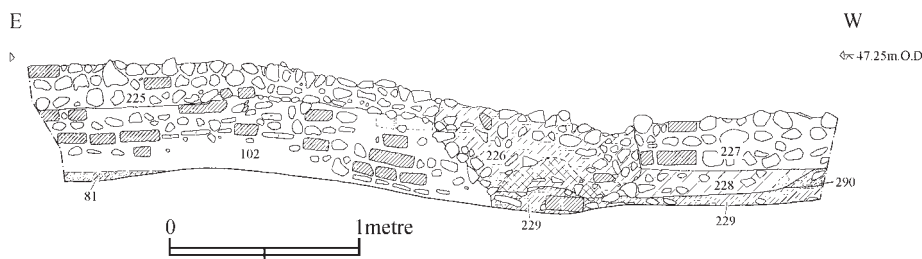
Repairs 225, 226, 227 to wall 102. Scale 1:40
